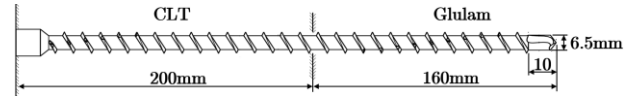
Fully threaded screw used at the glulam rib cut-back location
